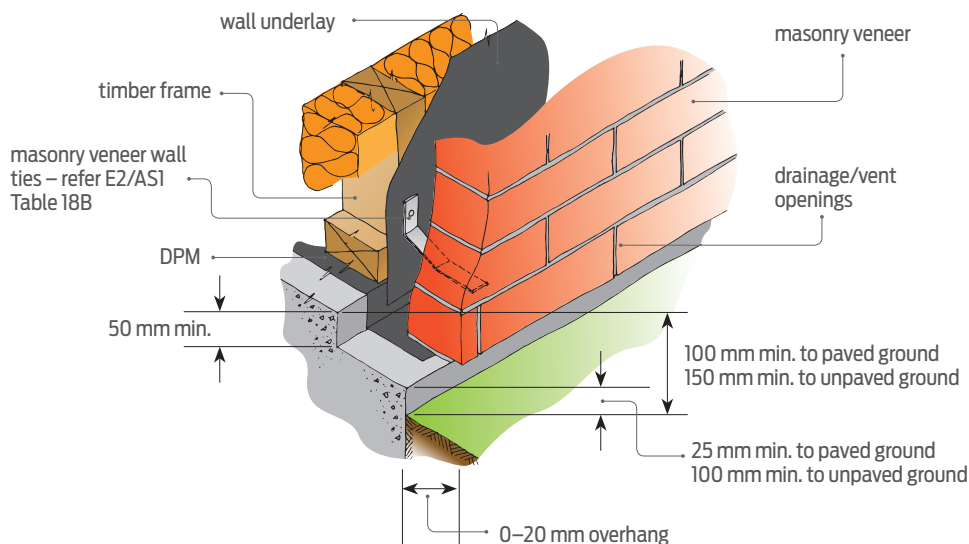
Masonry veneer detail showing clearances to paved and unpaved ground.
